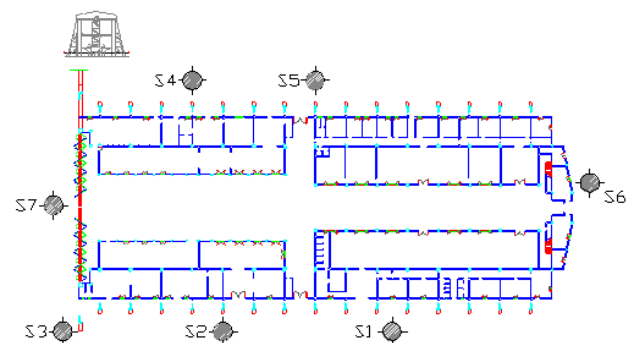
Layout of Augusta Hangar site and geotechnical boreholes S1, S2, S3, S4, S5, S6 and S7.
